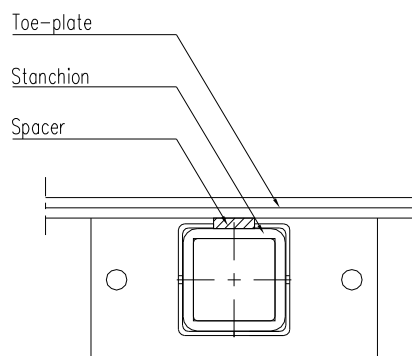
5mm spacer stanchion/toe-plate fixing for handrail system removal
